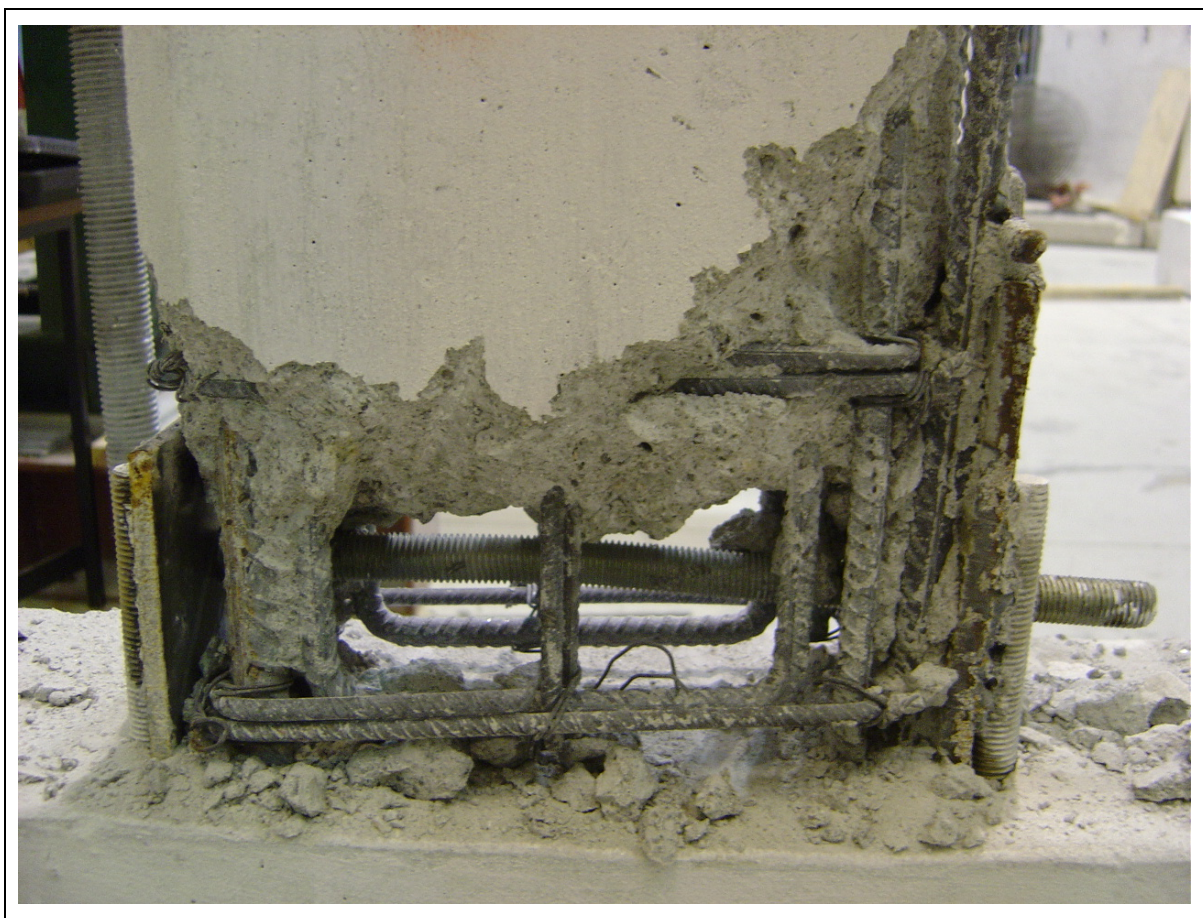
Specimen V1 – Reinforcing steel inspection.
